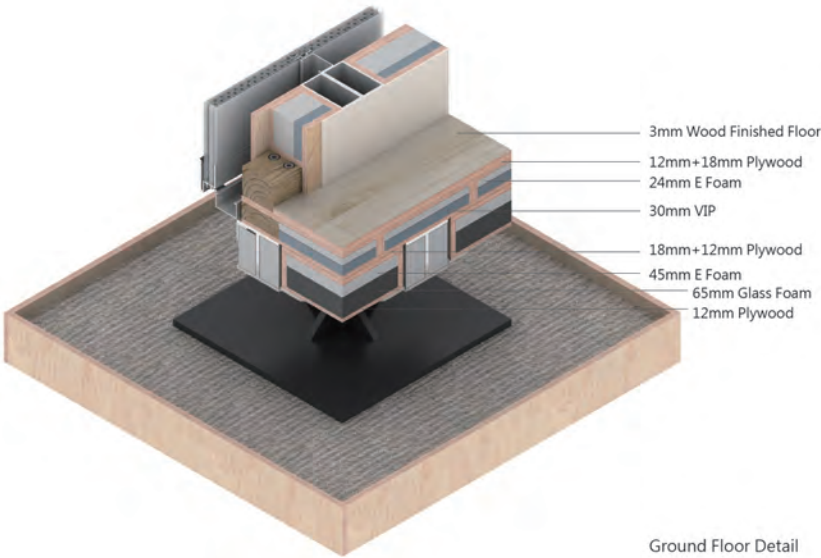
Adjustable Footing in Versailles Site
